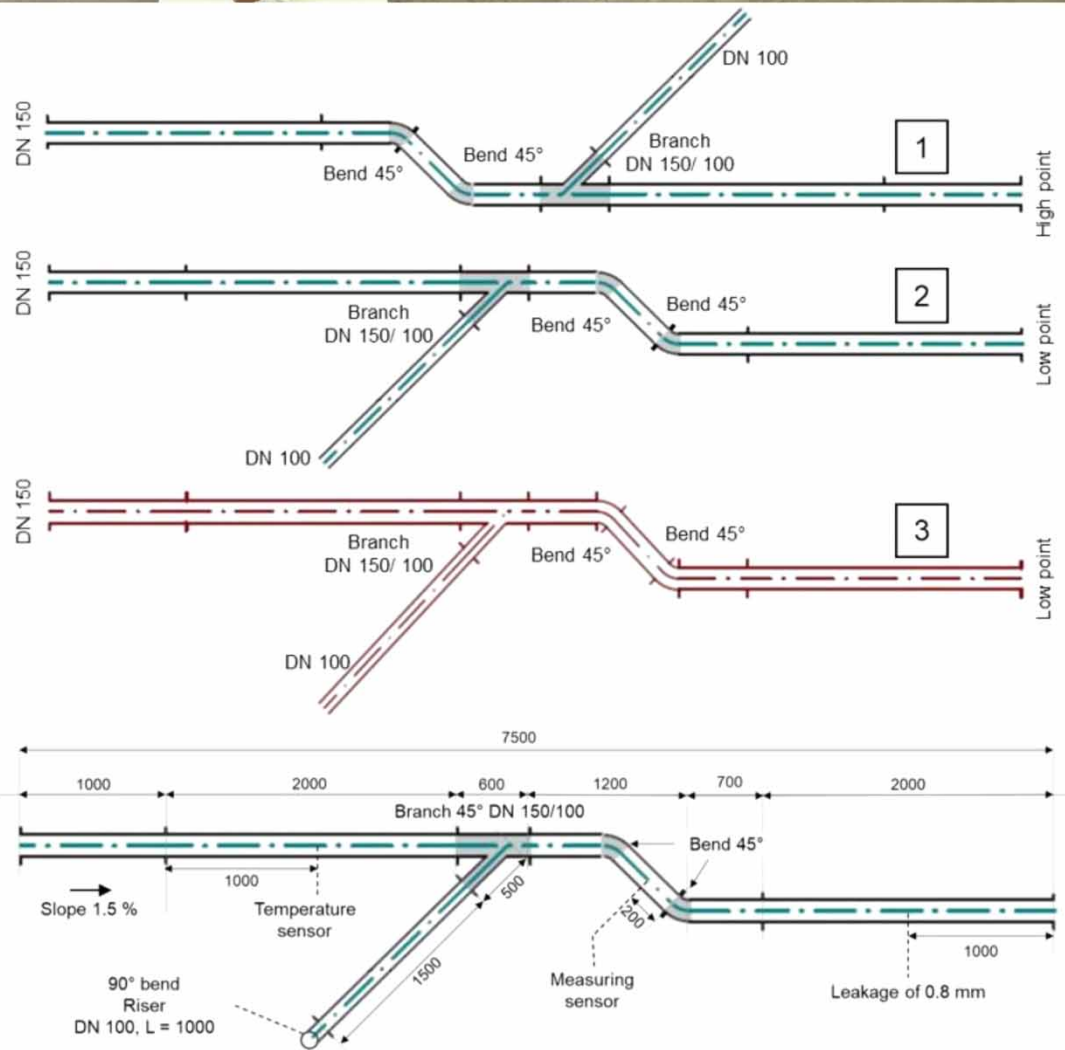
| Test set-up for the tests on the PVC-glass pipes (top) and sketch of the test set-up of the PVC and PVC-glass pipes with dimensioned detailed view of one pipe (bottom).
